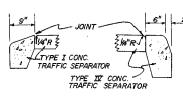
DETAILS OF TYPE IX CONCRETE TRAFFIC SEPARATOR
